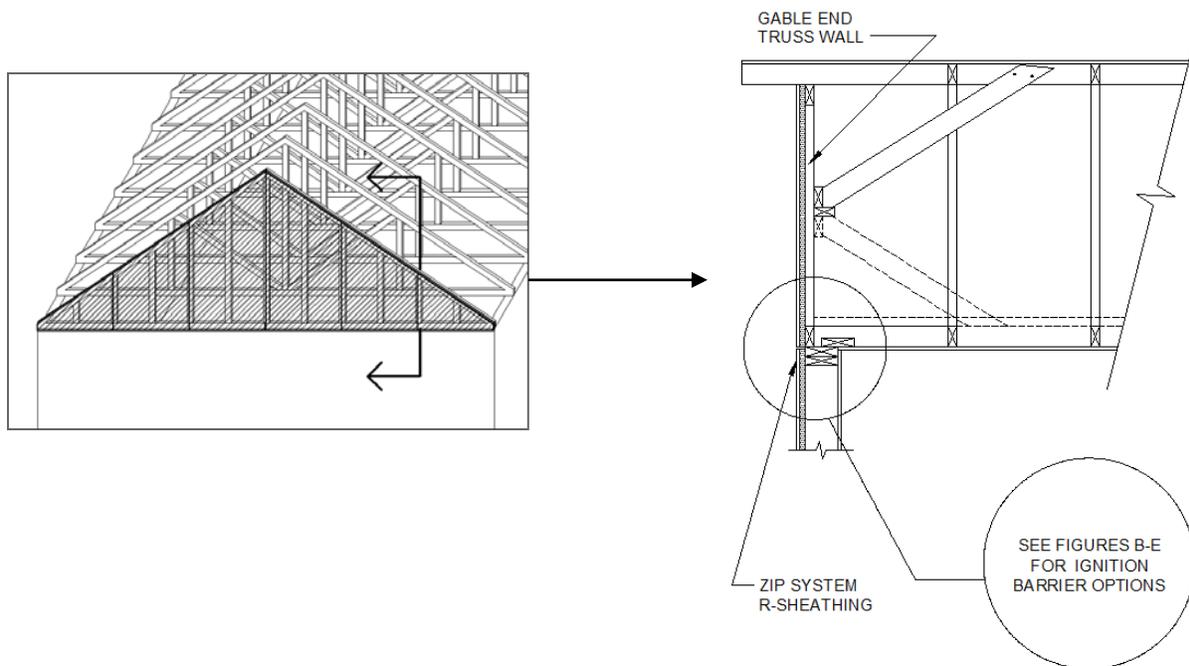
Figure A: ZIP System R-sheathing at Gable End Wall Truss
